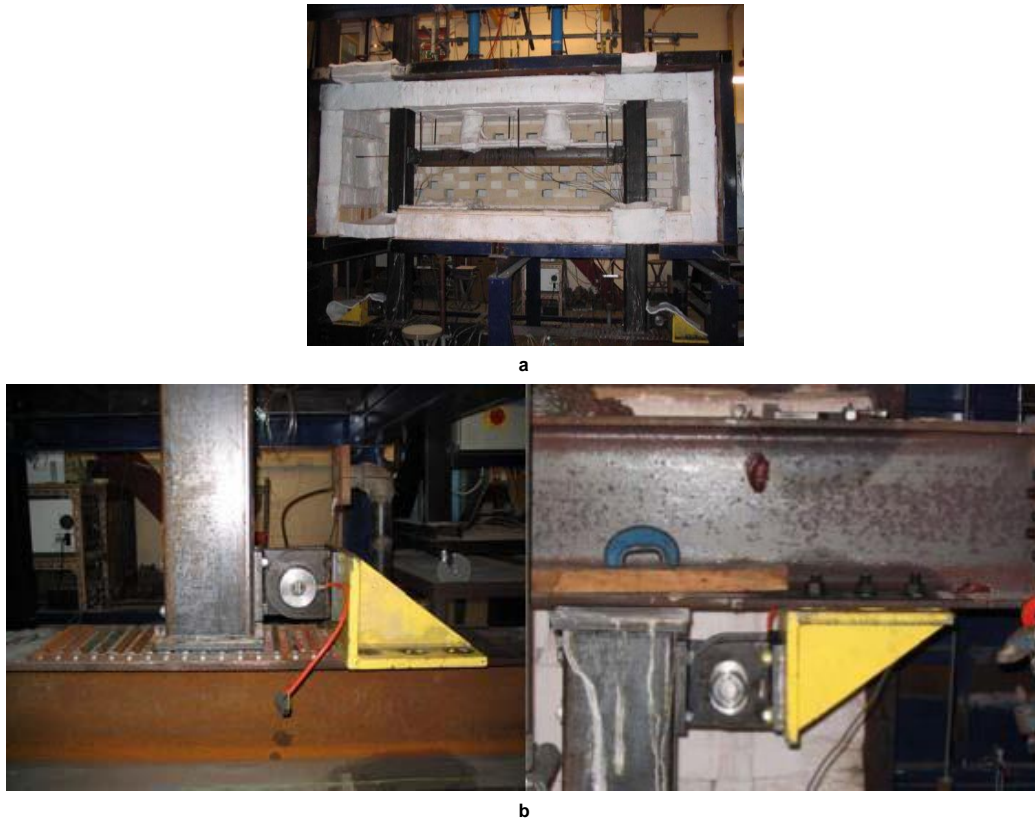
(a) Elevation view of schematic arrangement of test Ding and Wang. (b) The clamped scheme end of column of test Ding and Wang [5]
